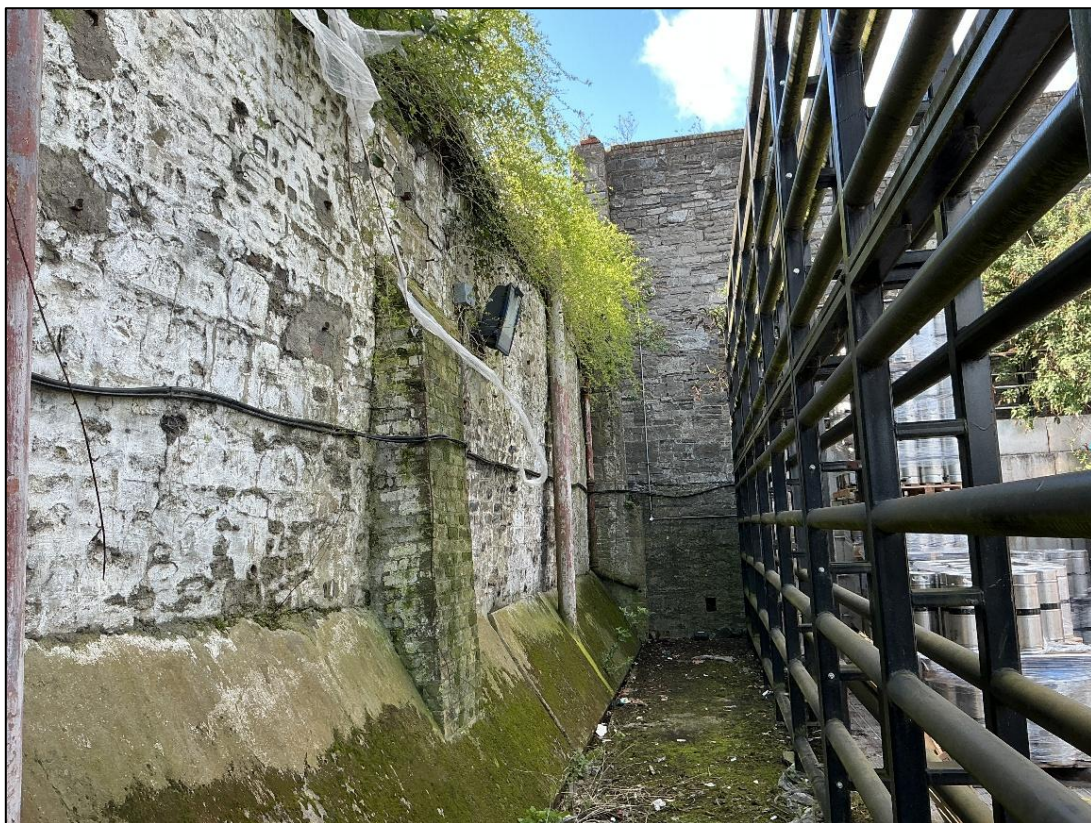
Existing Retaining Wall – Northern Boundary (zoomed in structural condition)
